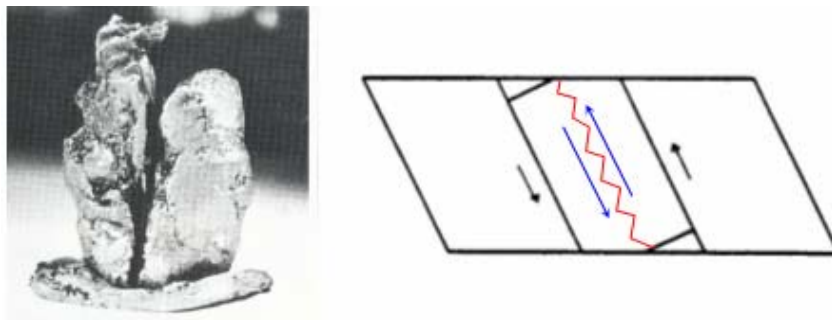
Failure of a bearing due to shear failure along the axis. (Source: Report No. 289, S.M Built, Dept. of Civil Engineering, University of Auckland, New Zealand)
